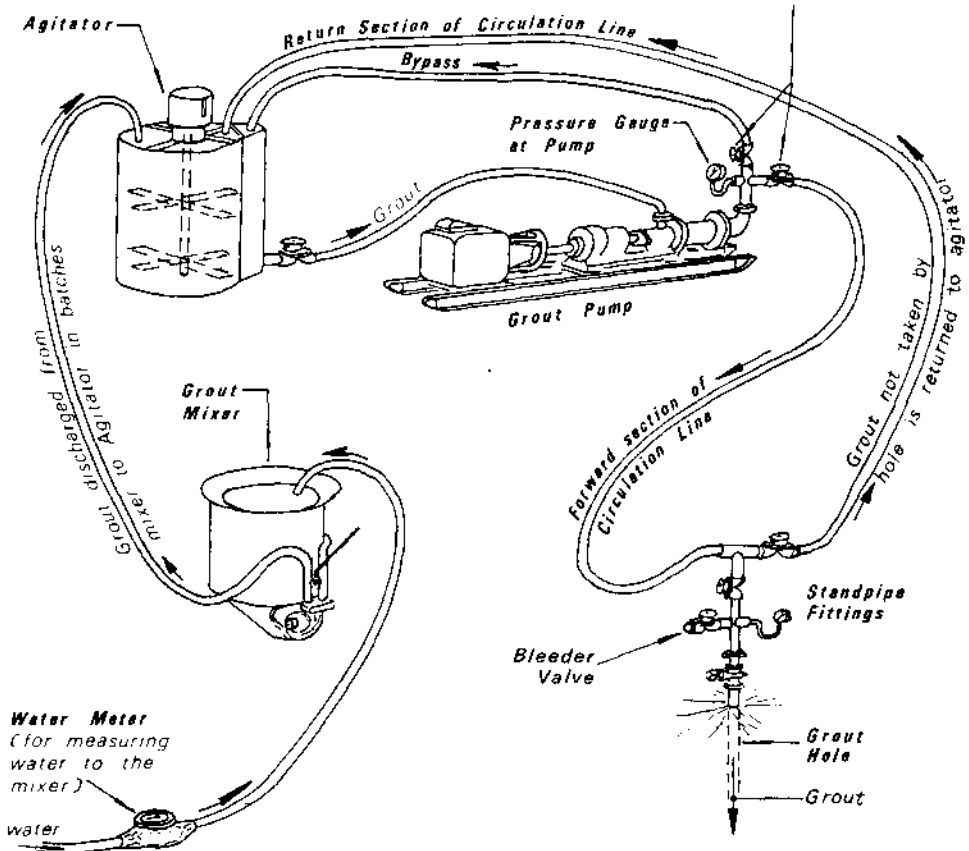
Typical arrangement of grouting equipment (Houlsby 1977, 1978, Water Resources Commission 1981).
